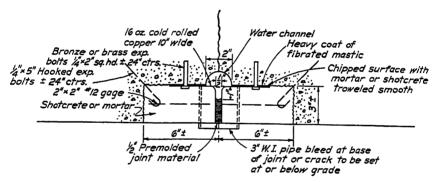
Repair of Joints or Cracks Where Movement Occurs in the Structure.
